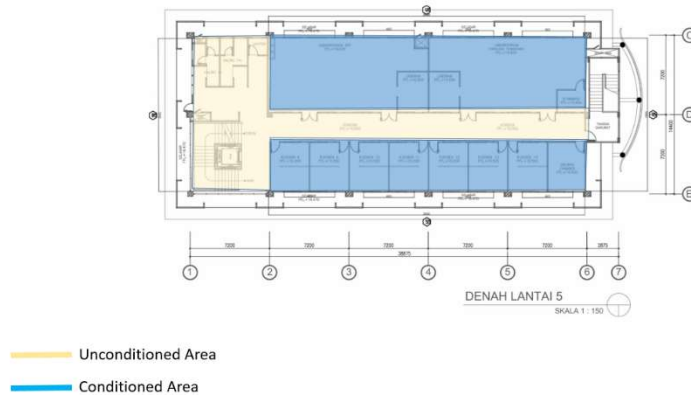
Floor Plan 5 Building B Faculty of Biology UGM
